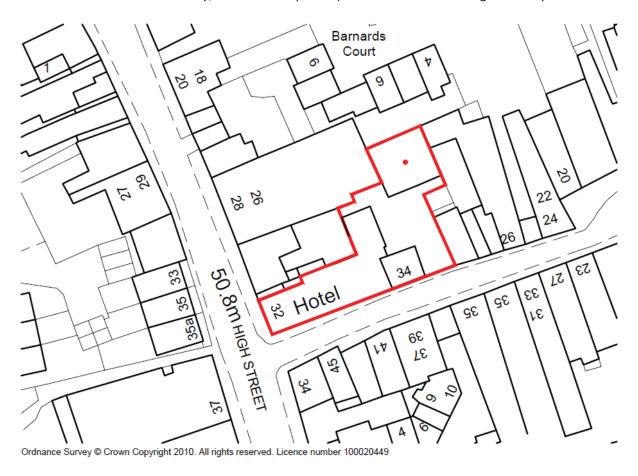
Site Plan. Building is indicated with red dot. (Courtesy of Melling Ridgeway and Partners)
